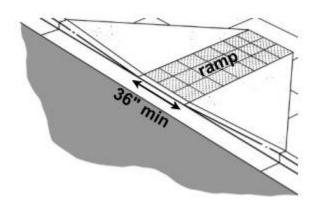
Ramp Width (Source: ADA Accessibility Survey Instructions Manual)
